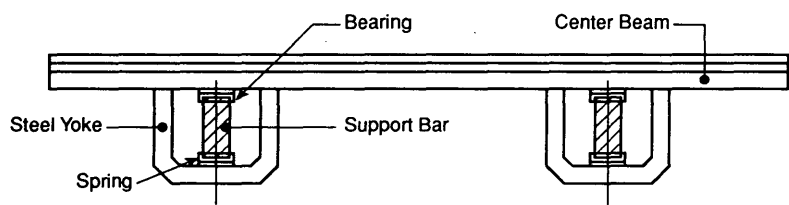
Section A-A showing center beam, support bar, springs, and bearings of single support bar system.
